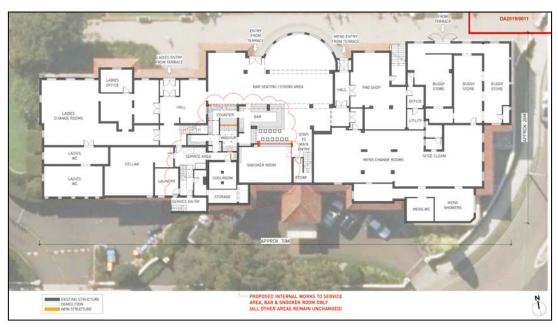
Approved plans for DA/2019/0011, noting the areas of alterations previously approved.
